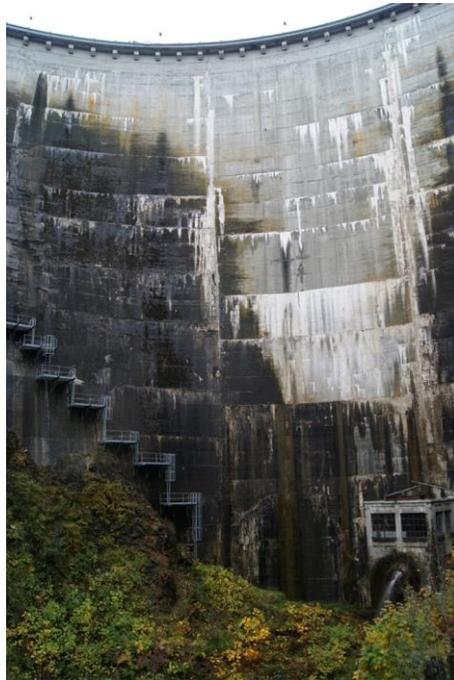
Cushman No. 1 dam, downstream face, showing valve house (right) and new stairs (left), viewing west.
